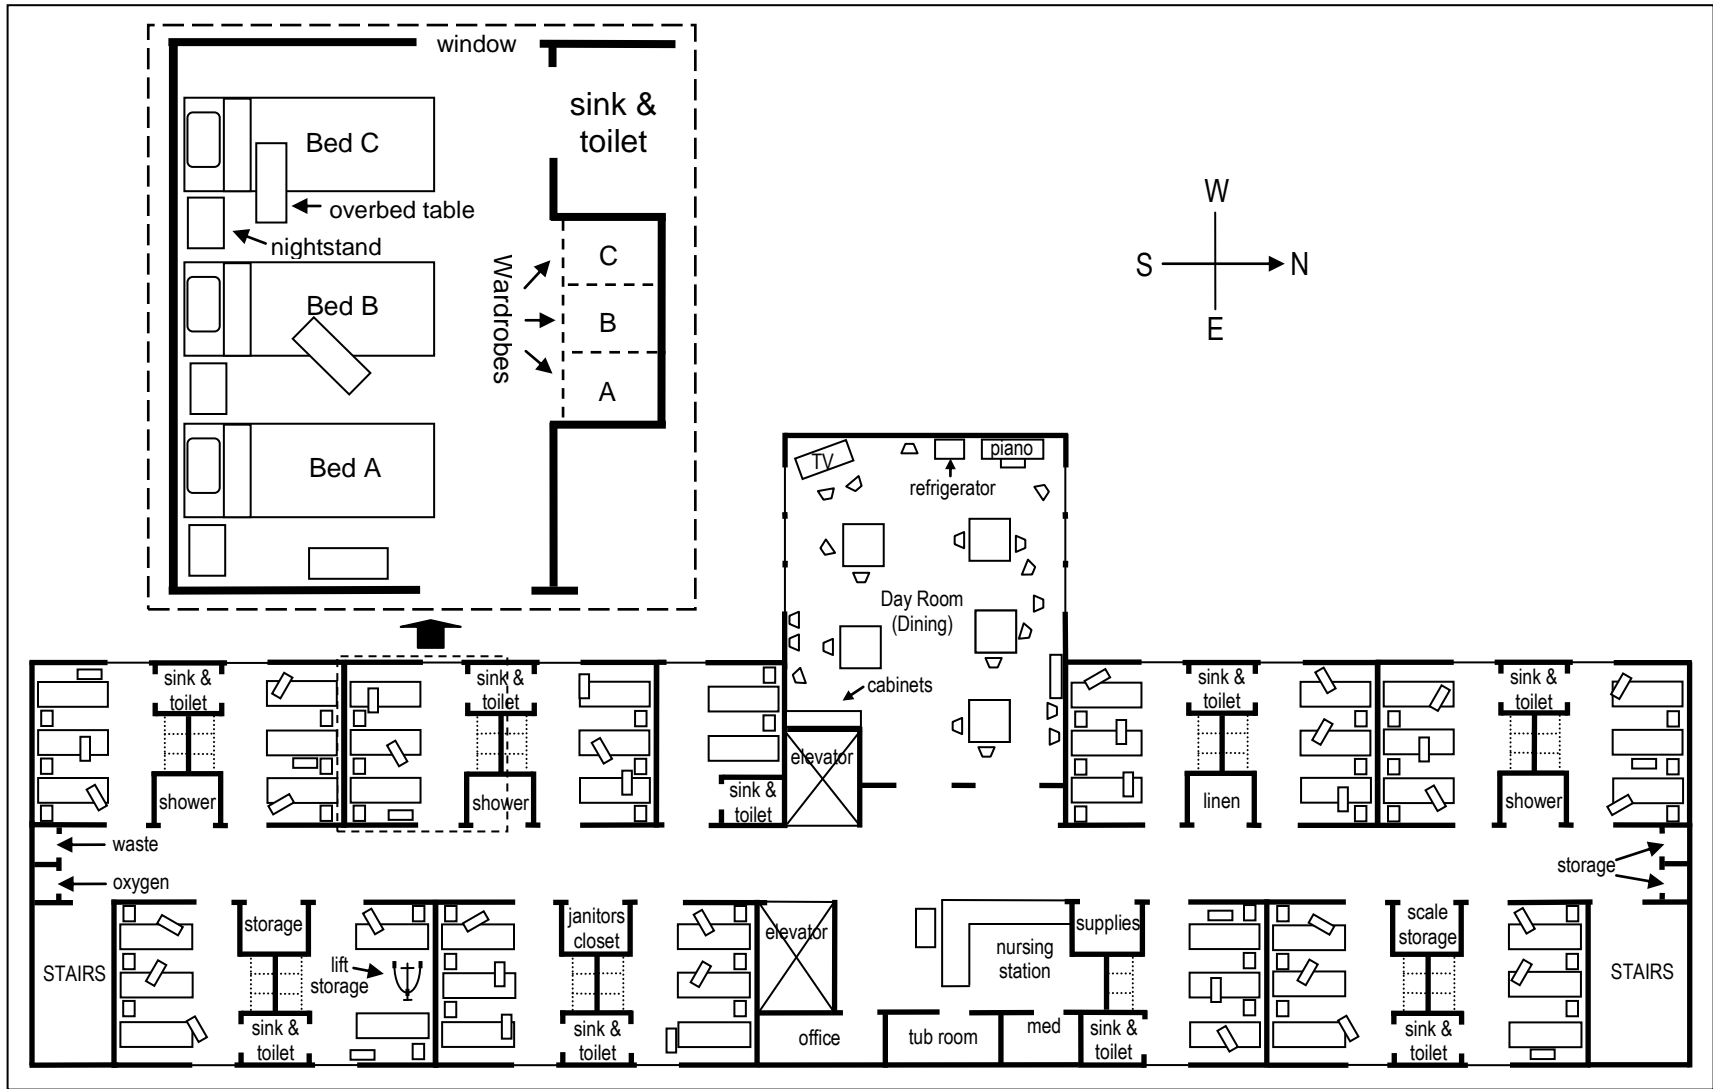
Lincoln Way Nursing Home, typical unit floor plan.
